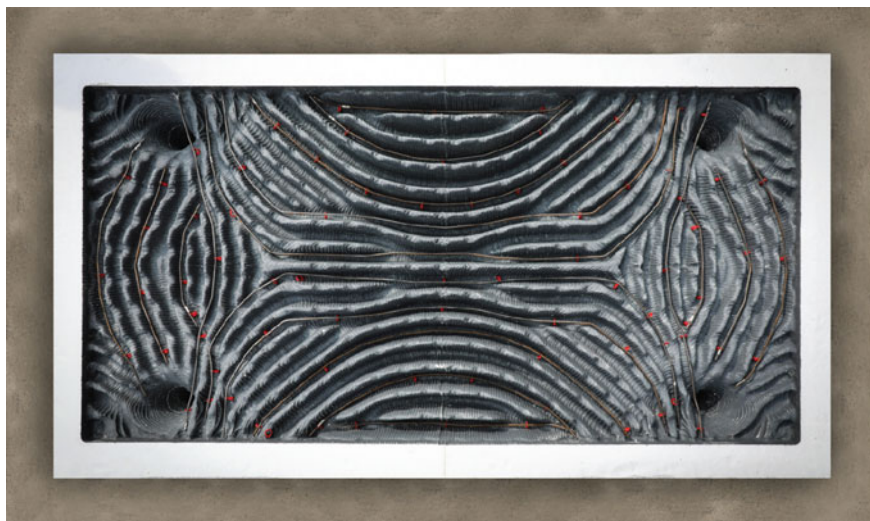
Coated formwork of RD Slab 01 with 3D bent rebars in MR
